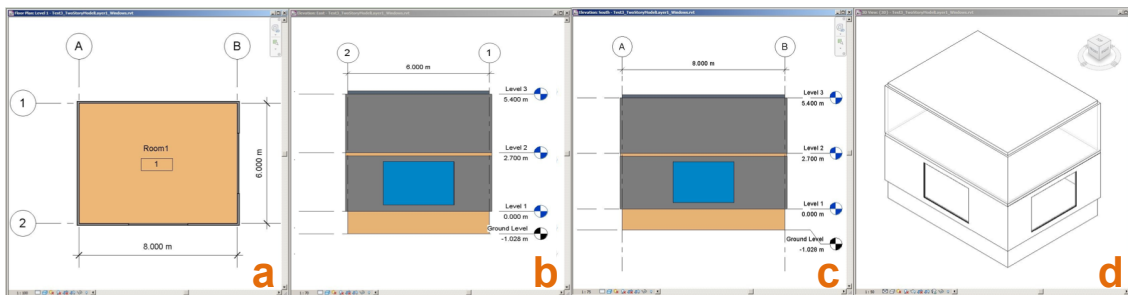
A two-story Revit model. (a) Floor-plan view of first level, (b) East-elevation view, (c) South-elevation view, and (d) Isometric view.
